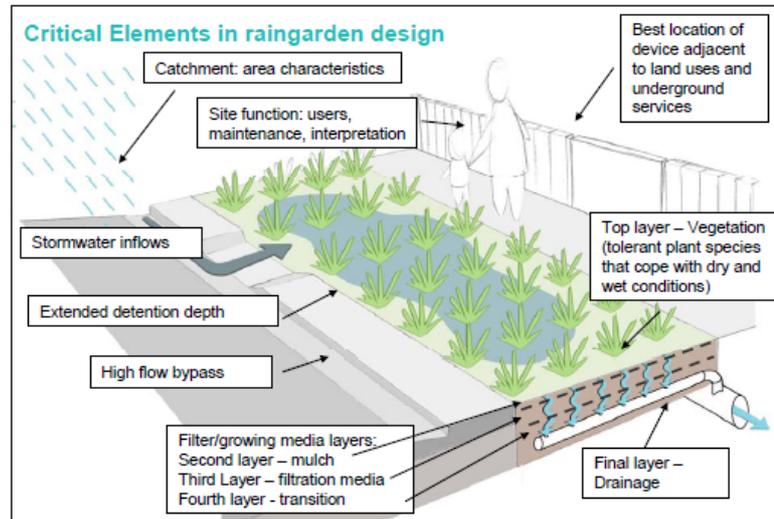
12 – Typical arrangement – Biofilter or Rain garden
